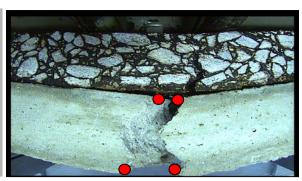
Slab without fracture collaboration (db=7mm), cracking in slab
